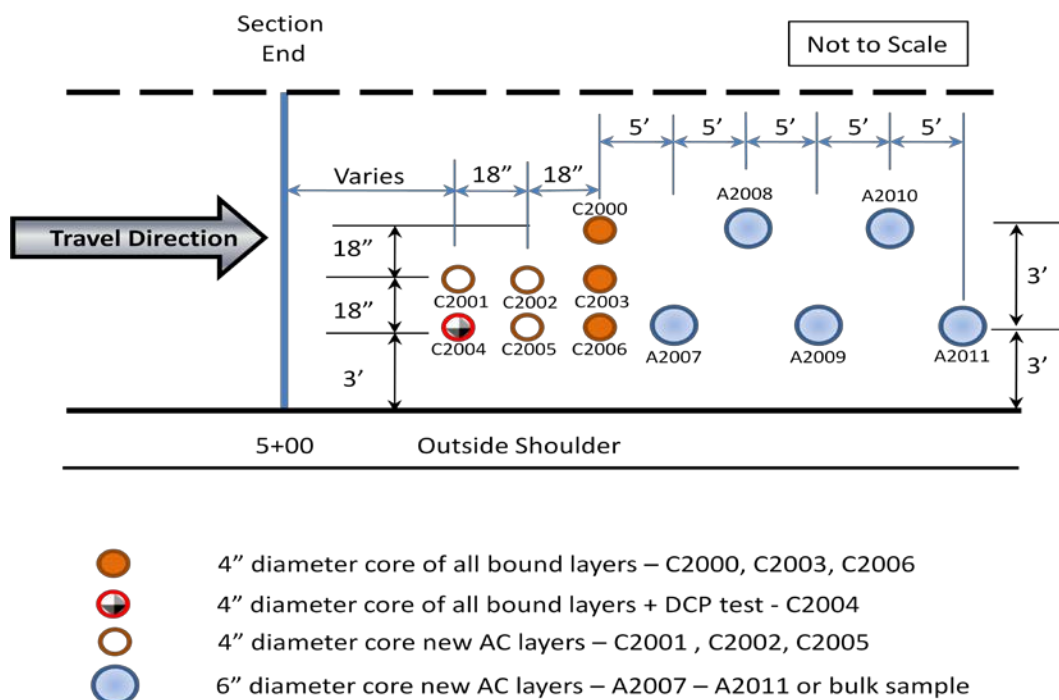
Standard sampling plan locations at leave end of test sections for new AC overlays.
